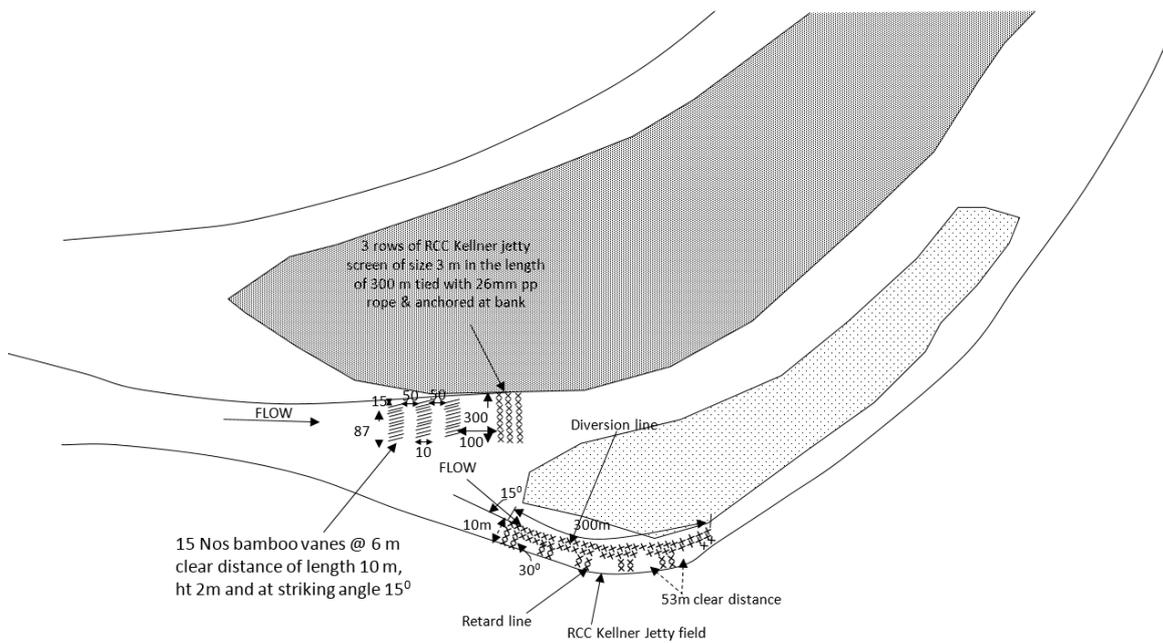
(B): Detail Arrangement of Location (B) At Nakhwa Site (Ch 1299)
